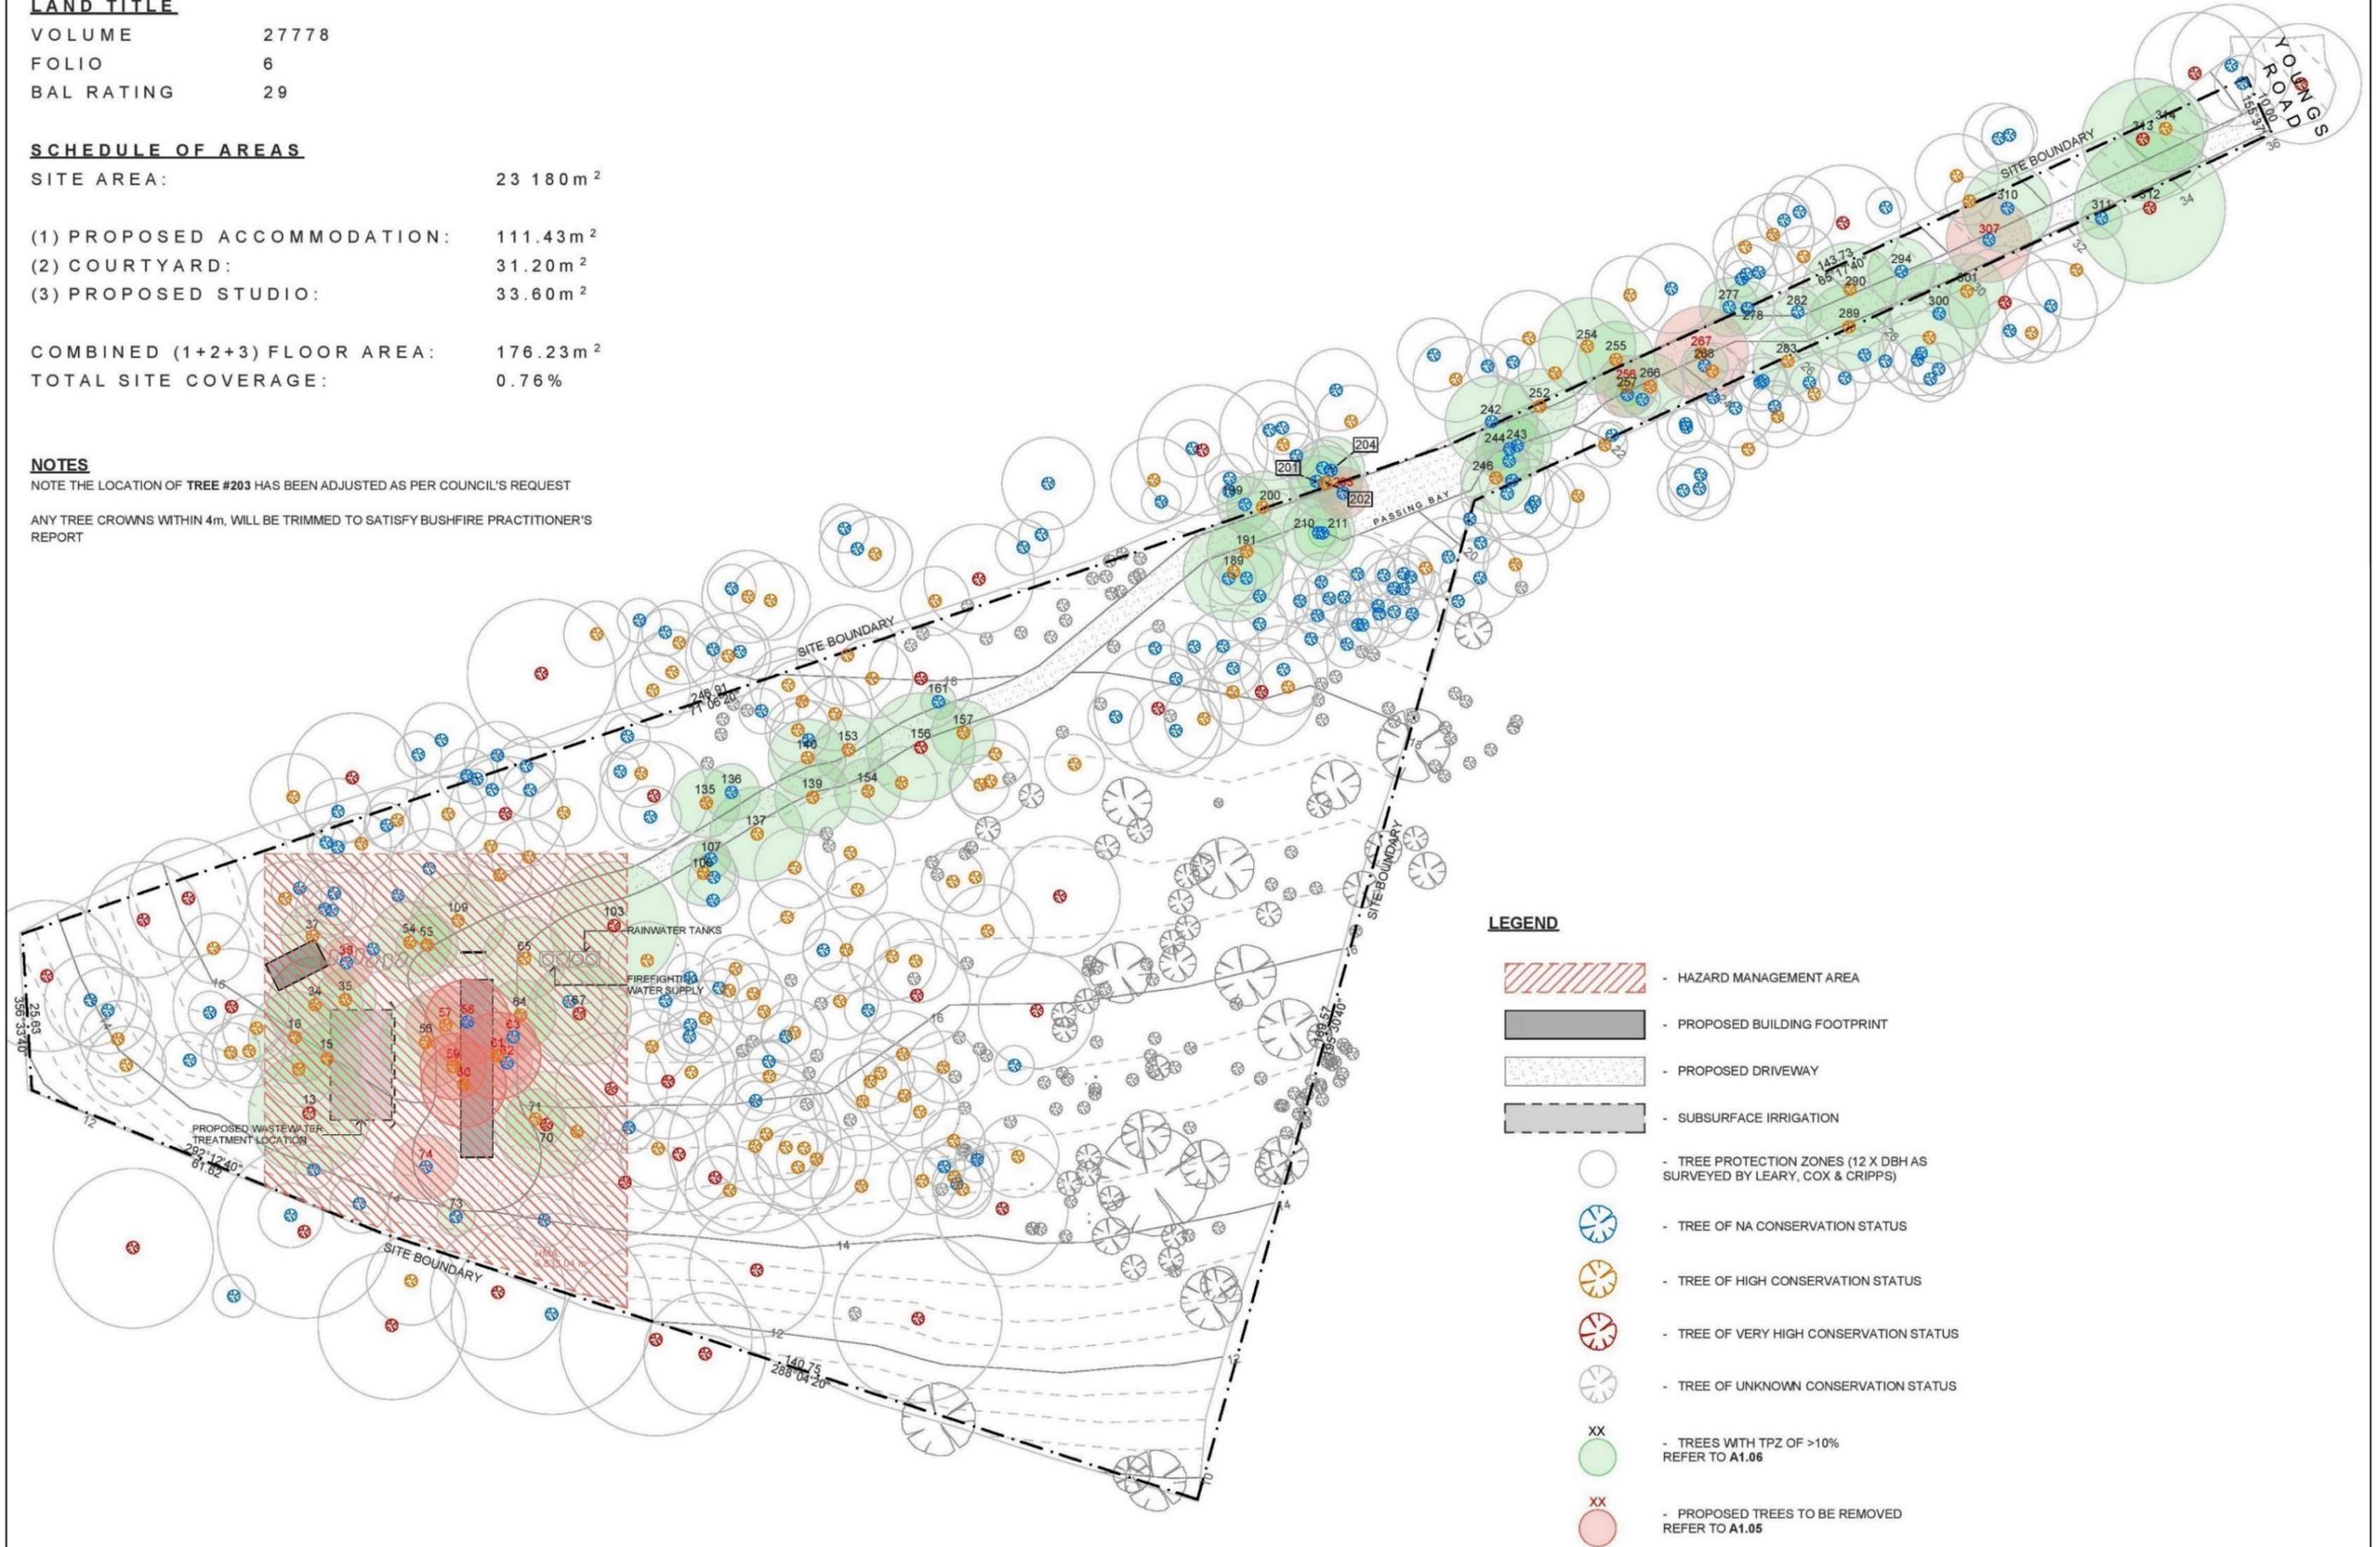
Site-plan showing conservation status of trees (cropped from page 8 of Architectural Plans by Room11 Architects, March 2023)
